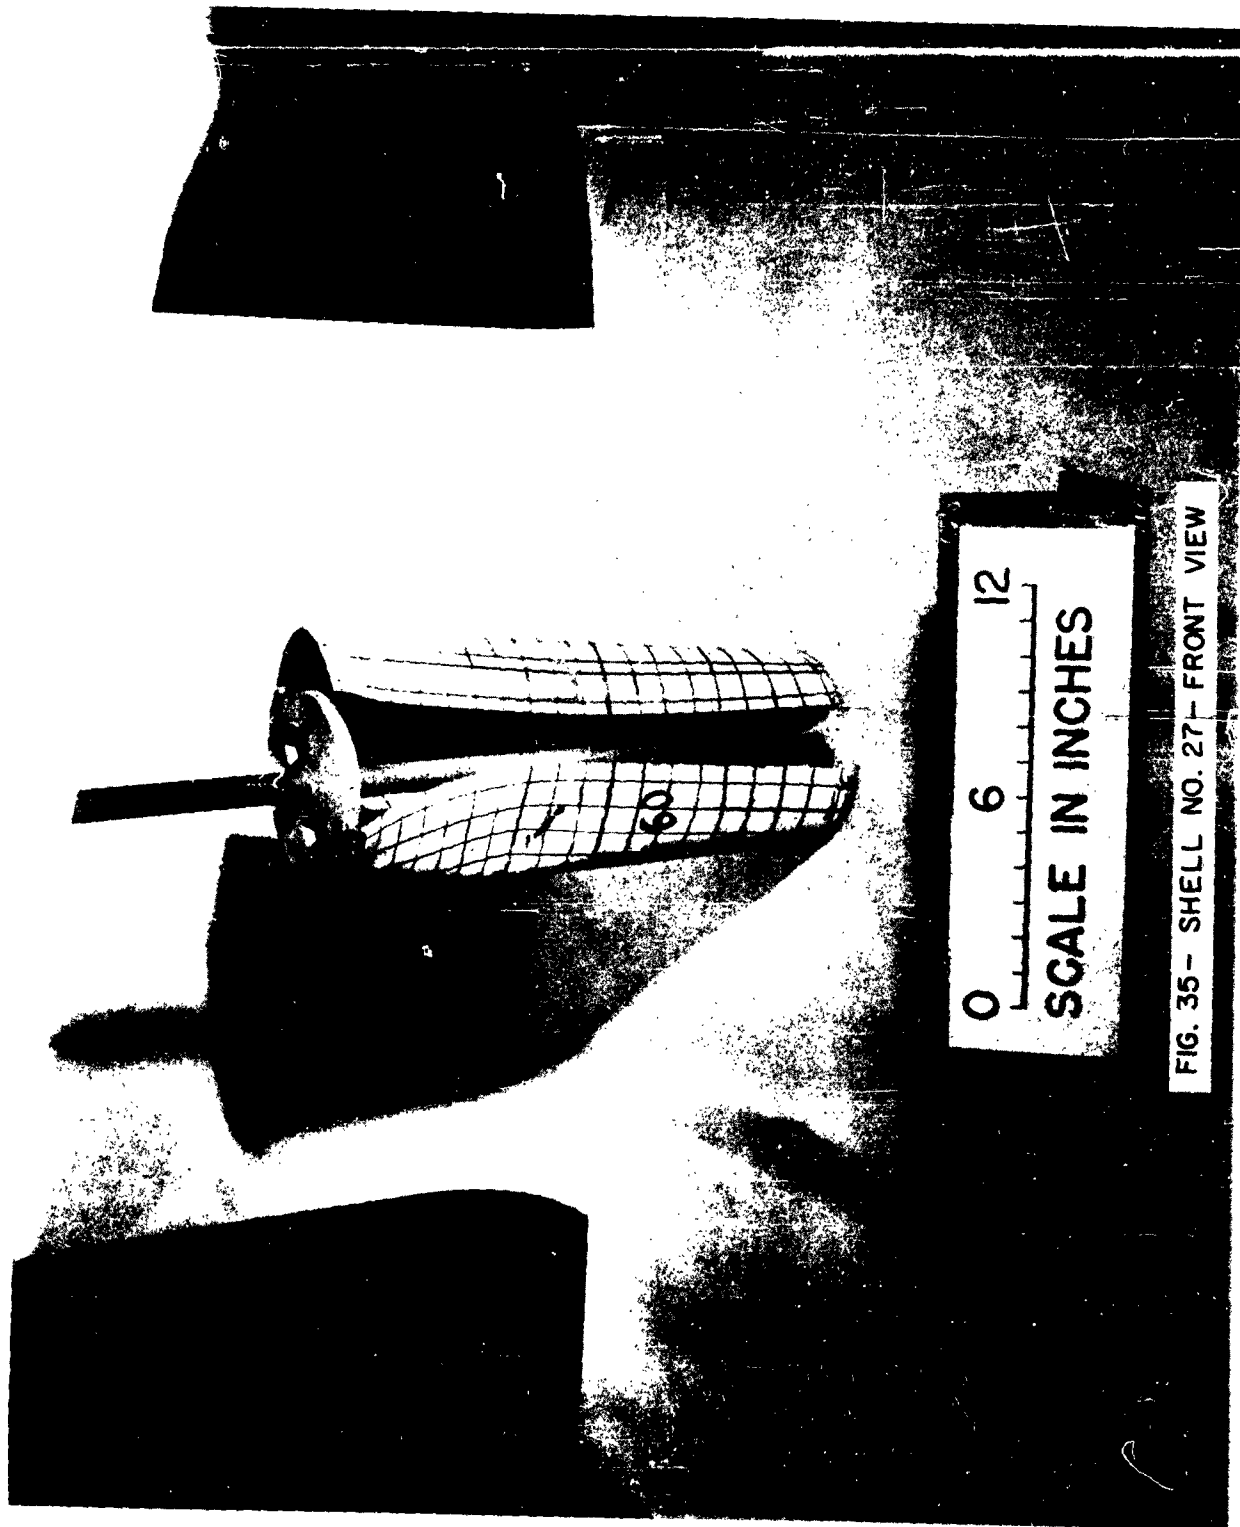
SHELL NO. 27 - FRONT VIEW
